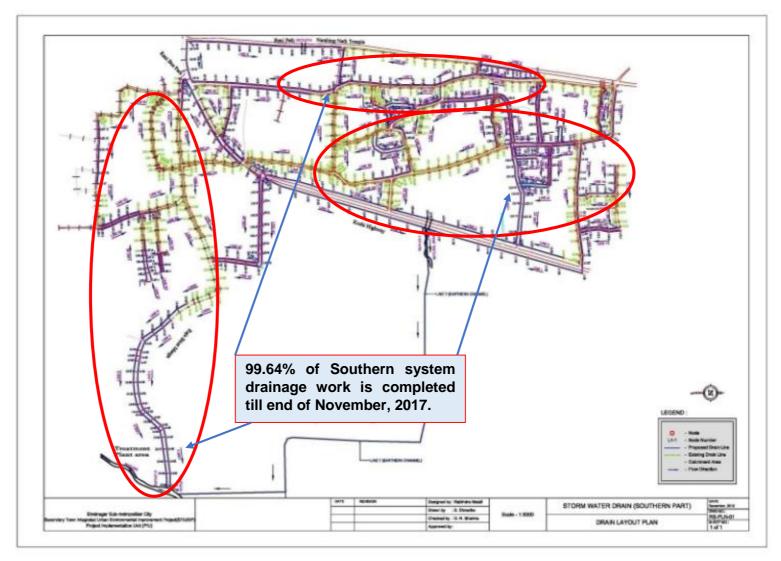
PROPOSED STORM WATER DRAINS IN BMC (Southern Drainage System)
